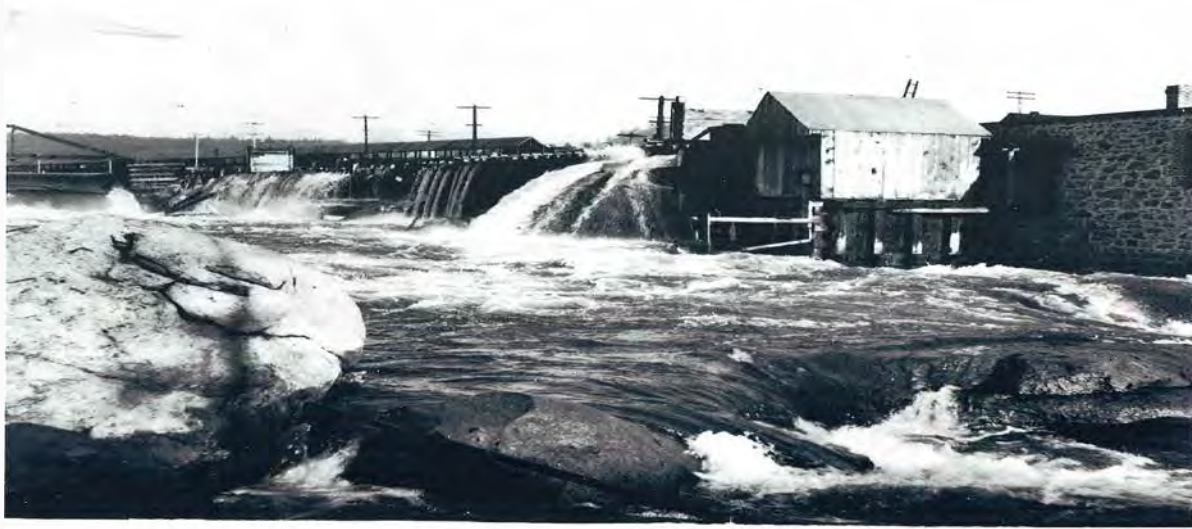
Truckee Power and Light Company stone power plant building and flume system (ca. 1888); plant was located on the north side of the river on East River Street immediately upstream from the Tecoma Smelter; photo courtesy of Truckee Donner Historical Society
